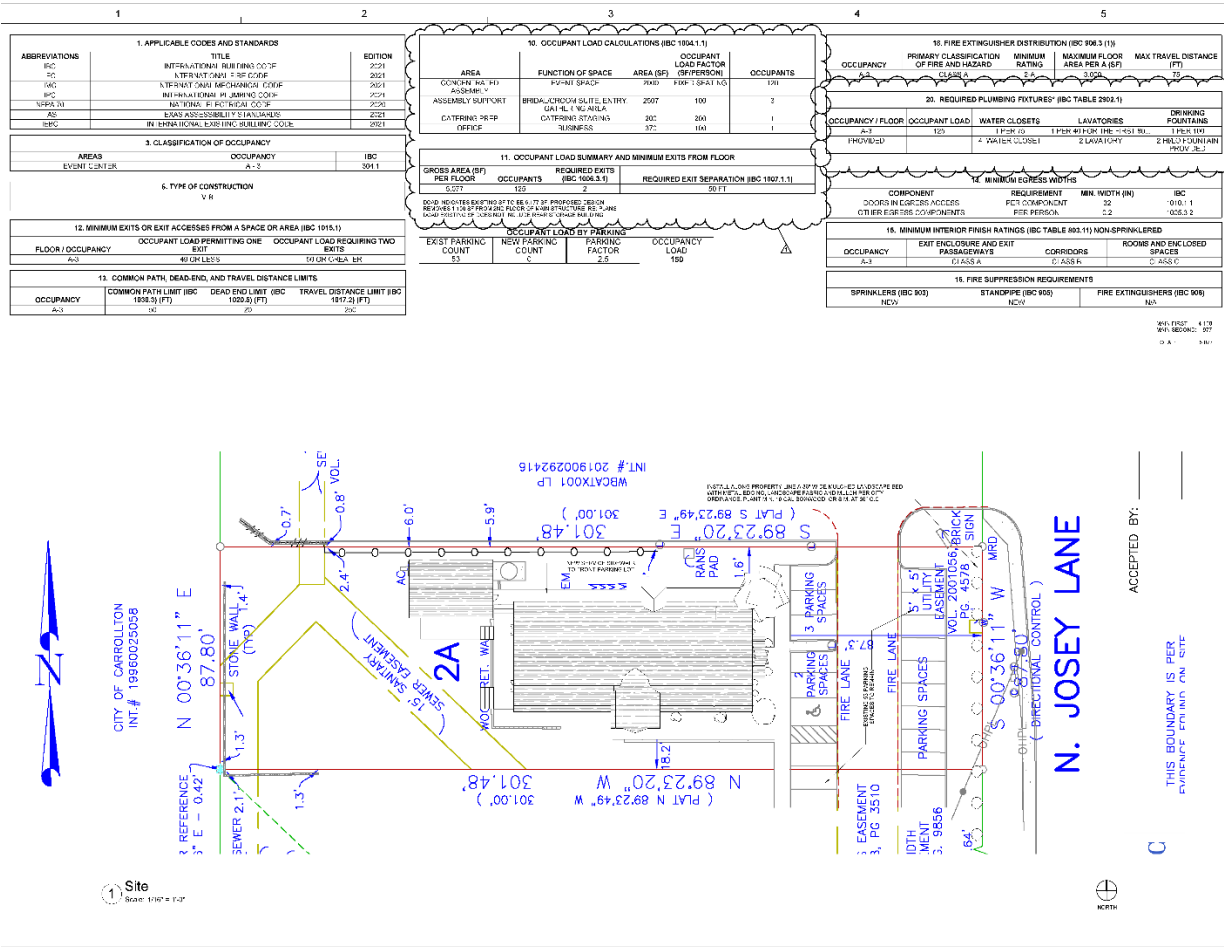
EXHIBIT C CONCEPTUAL FLOOR PLAN
